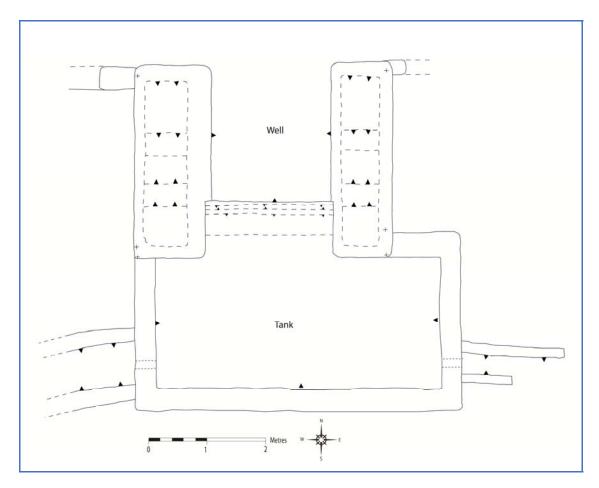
Plan of well, Structure 1 without the later modern wall shown.
